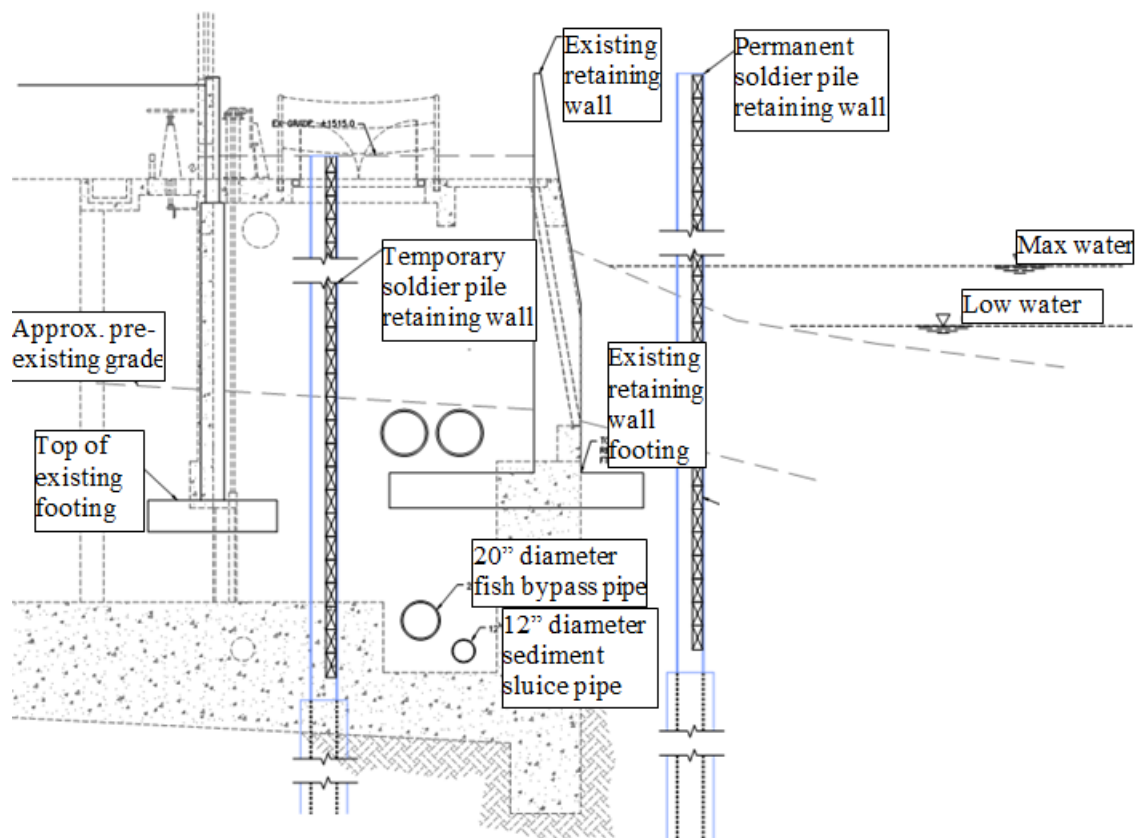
Construction concept for installation of supply pipes, showing site constraints (Bennett, C. and Kingsley, S., 2013).
